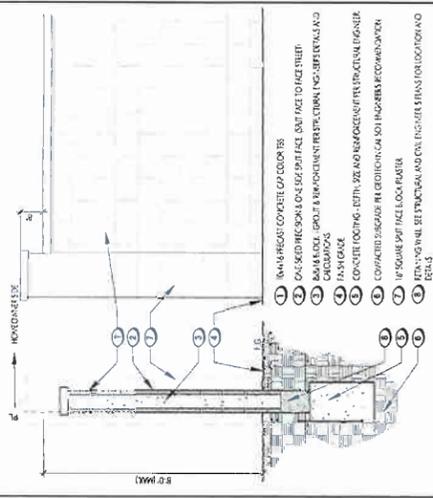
'-6" HIGH PROJECT THEME PLASTER & WALL
